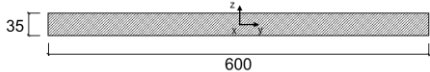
Cross section of the numerical model of the concrete slab.
